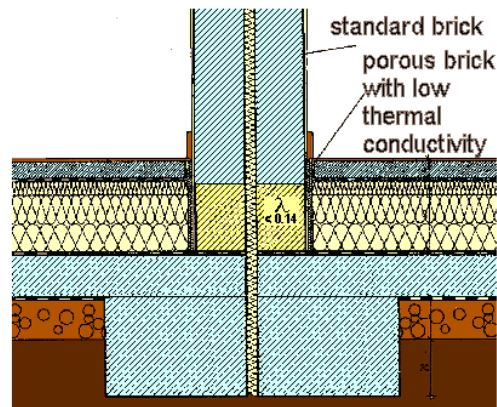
The thermal bridge at the joint of the interior masonry wall with the slab. [41]
